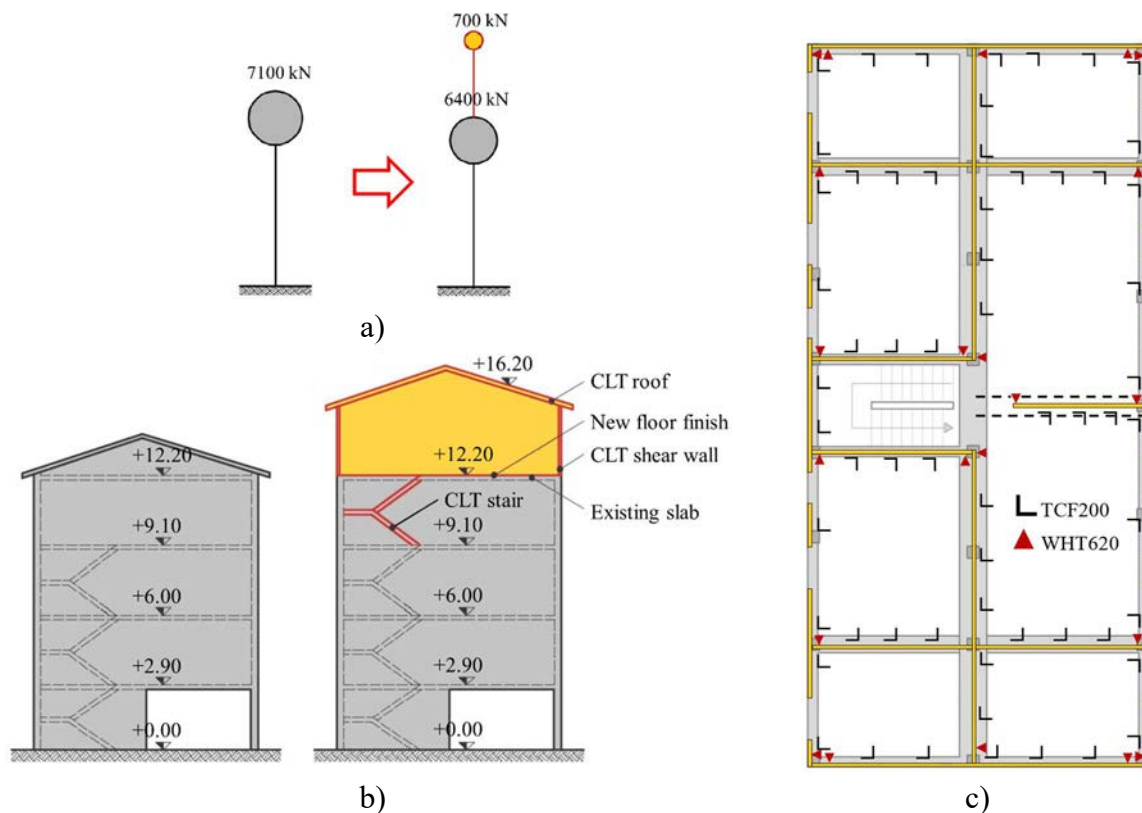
a) Total weight of the case study building before and after the timber vertical addition. b) Vertical expansion of the case study building. c) Plan of the CLT shear wall and of the steel connectors of the timber vertical expansion.
